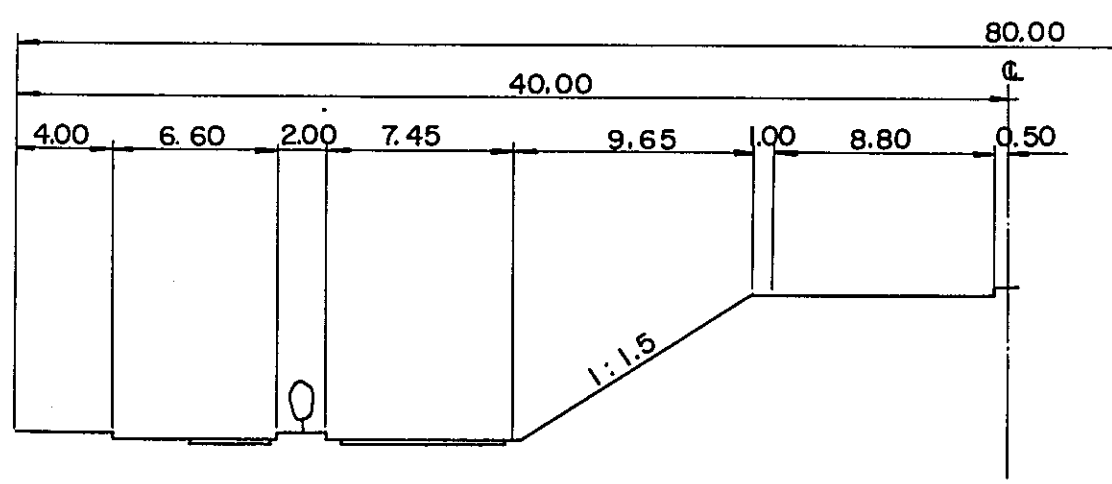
ROADWAY CROSS SECTIONS
